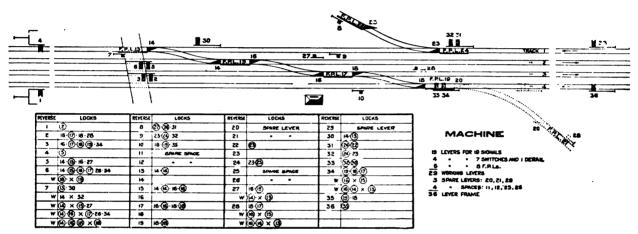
Typical Interlocking Plan and Locking Sheet; Double Track to Four-Track Junction.
